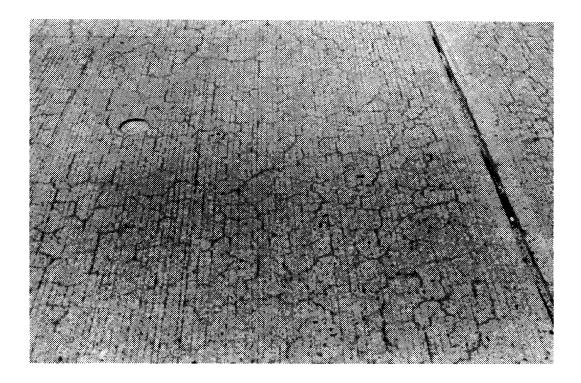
Approach slab at east end of structure 2904 on I-295 EB.
